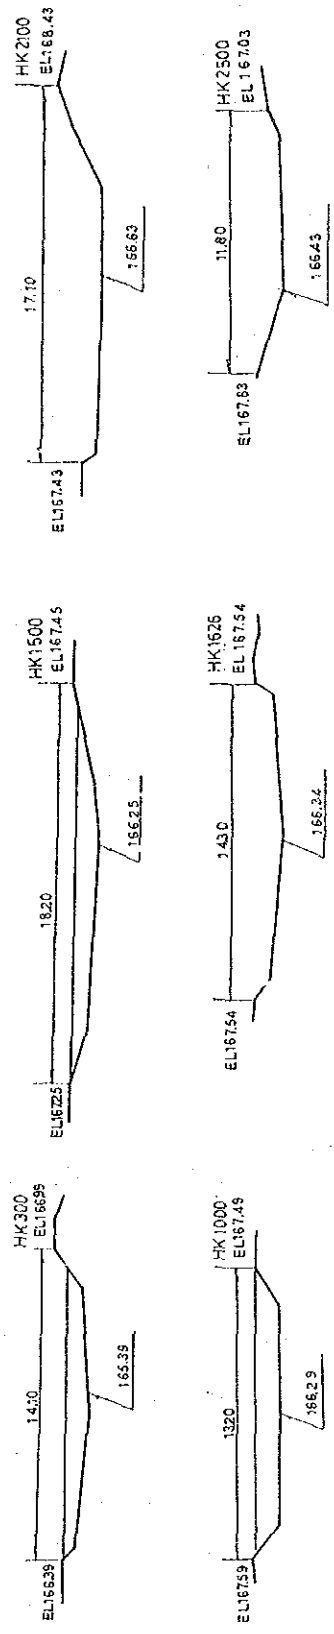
(2) Longitudinal Profile and Cross Section (Hong Thong)
